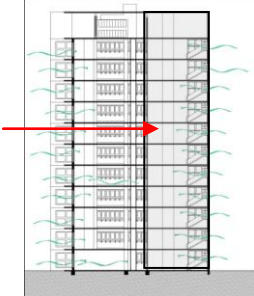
Sectional elevation through the building and Cross section through the north south plain to show the natural cross ventilationSource: (Robson D. , 2002) and Author
